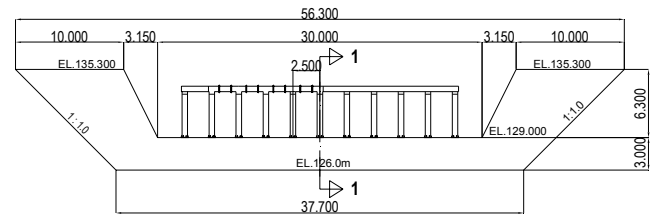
Layout Plan of Garbage Trapping Structure at Intake
